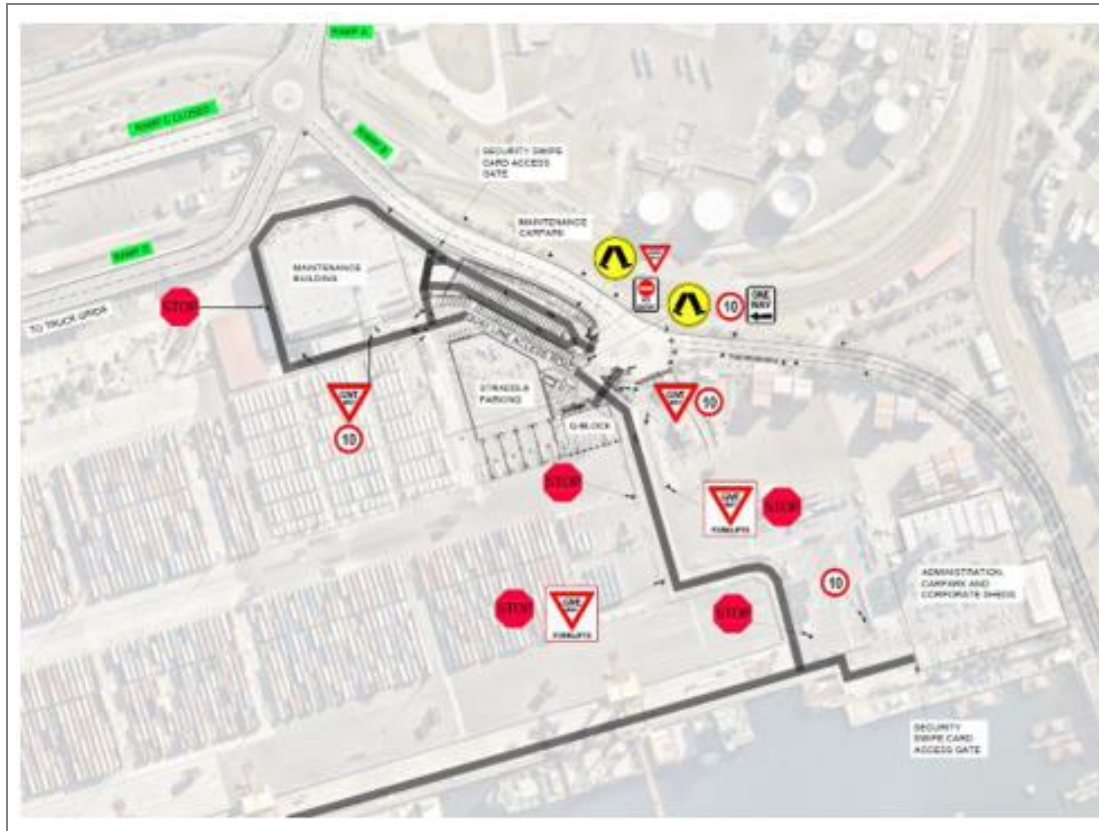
AREA 5 – Auto Rail Access Road and Ramp c
